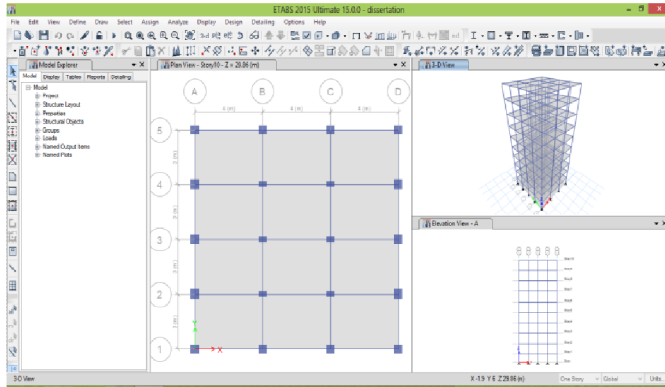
D view and elevation of the structure modelled by ETABS
